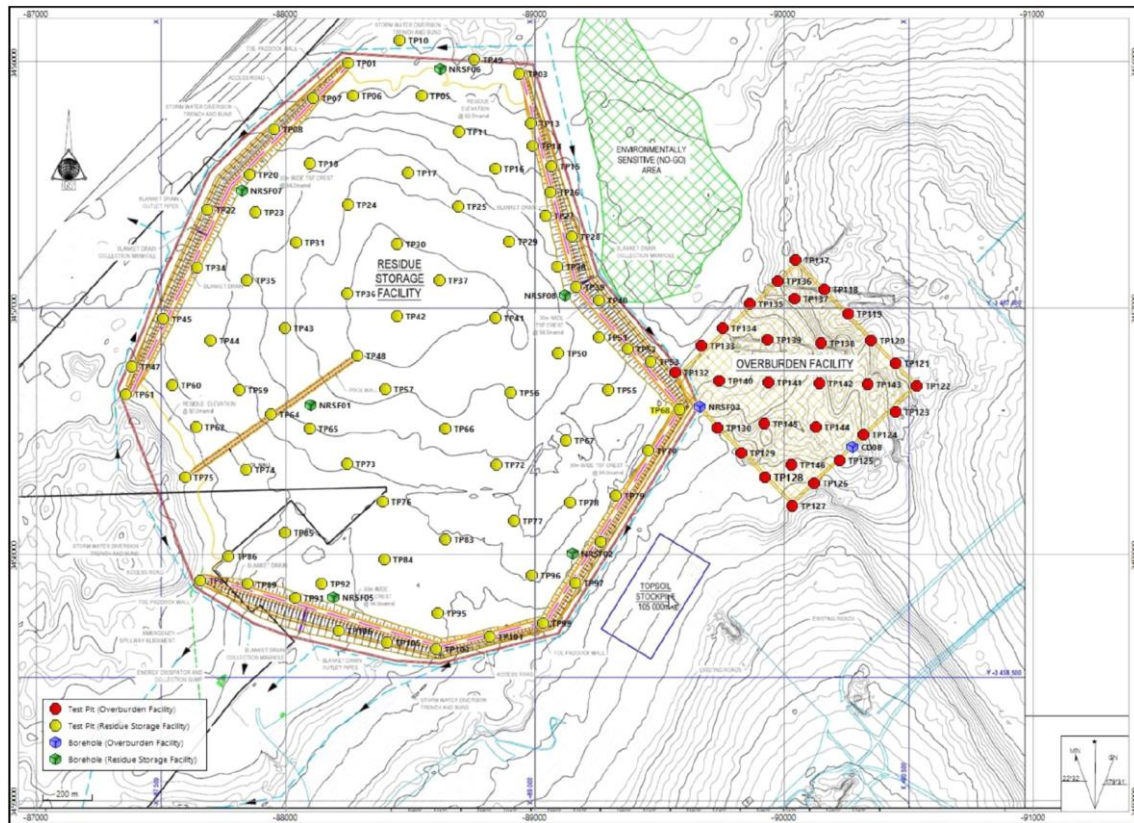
RSF TEST PIT AND CORE DRILL LOCATIONS
